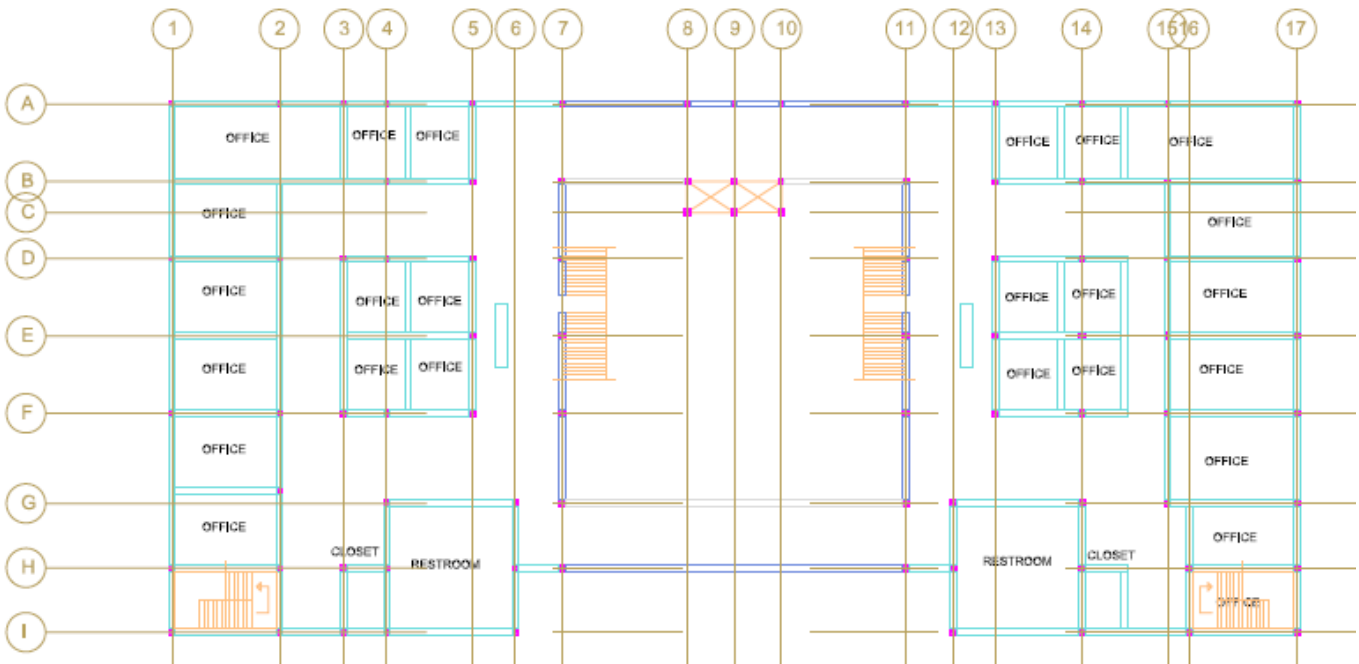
The second floor will have 24 offices, 2 storage closets and 2 restrooms
